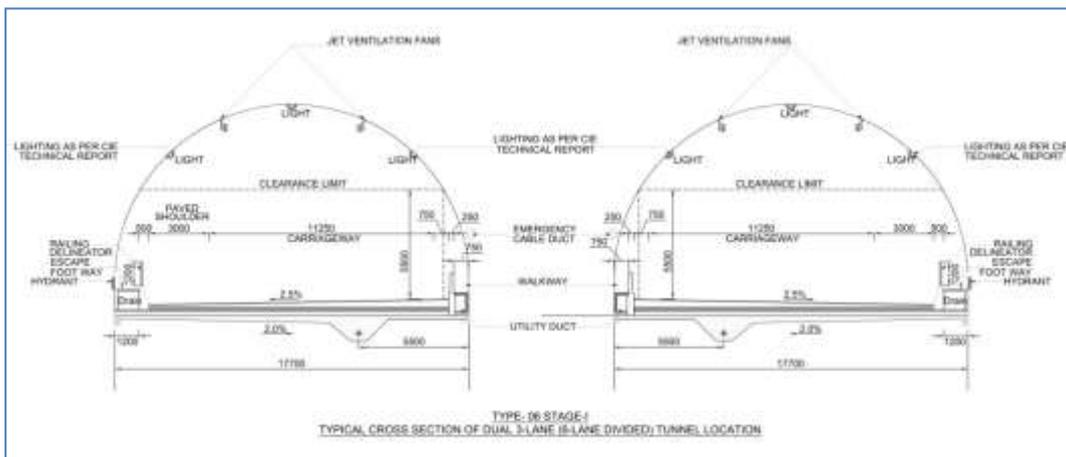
Proposed Cross Section of underground Tunnel at MHTR/Darrah wildlife sanctuary
